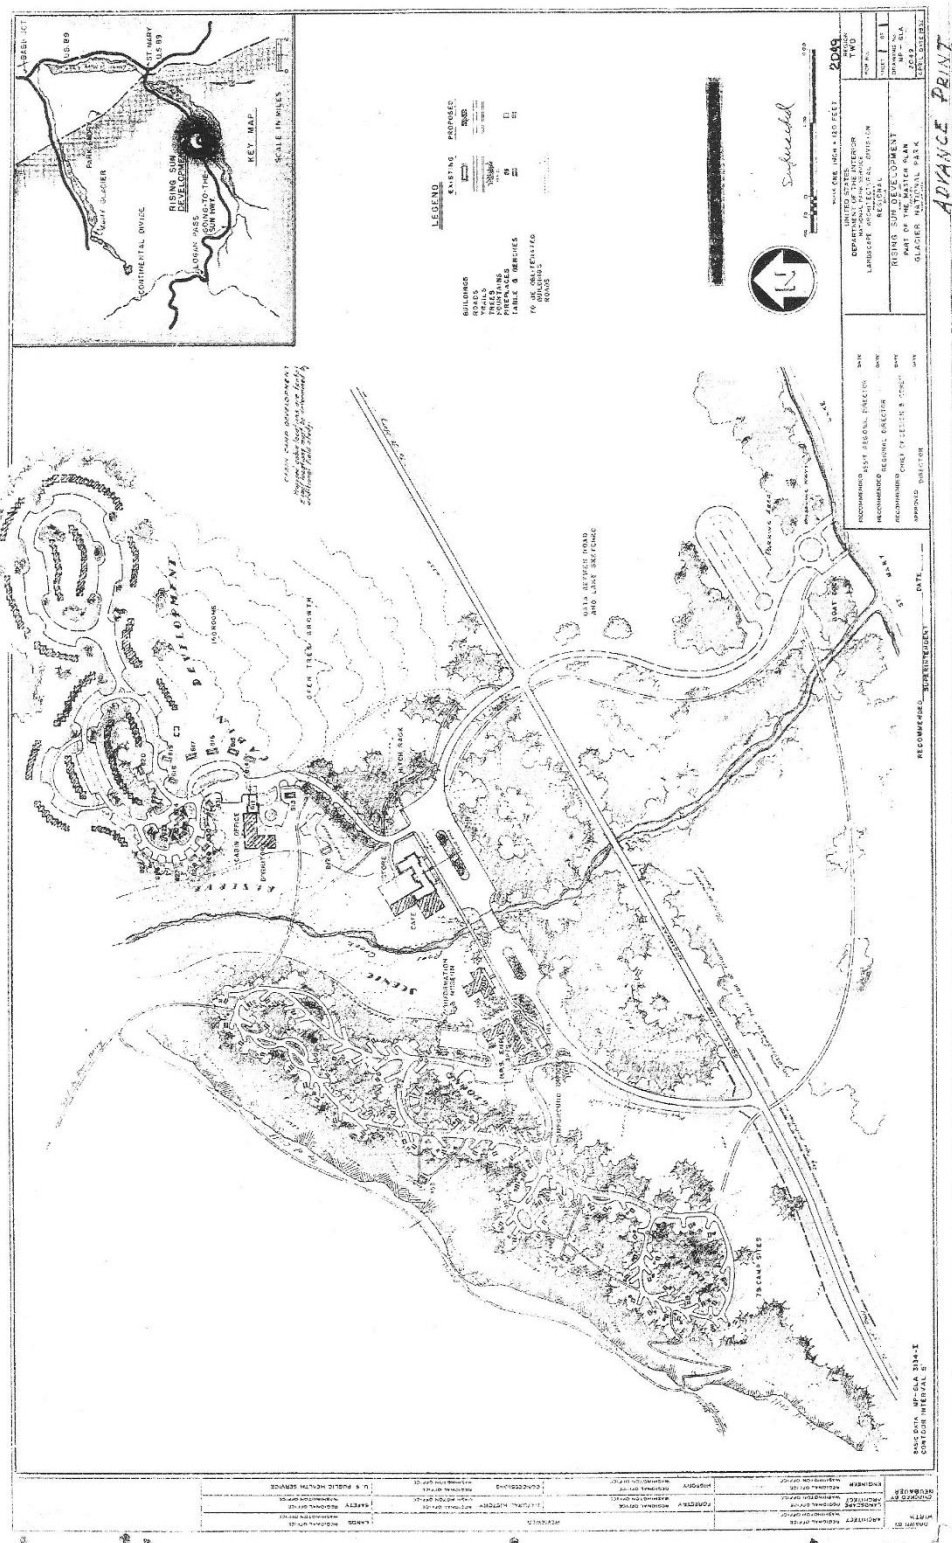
This 1952 plan shows expansion with more housekeeping cabins. Instead, new construction would feature motel units rather than cabins. (Technical Information Center drawing.)
